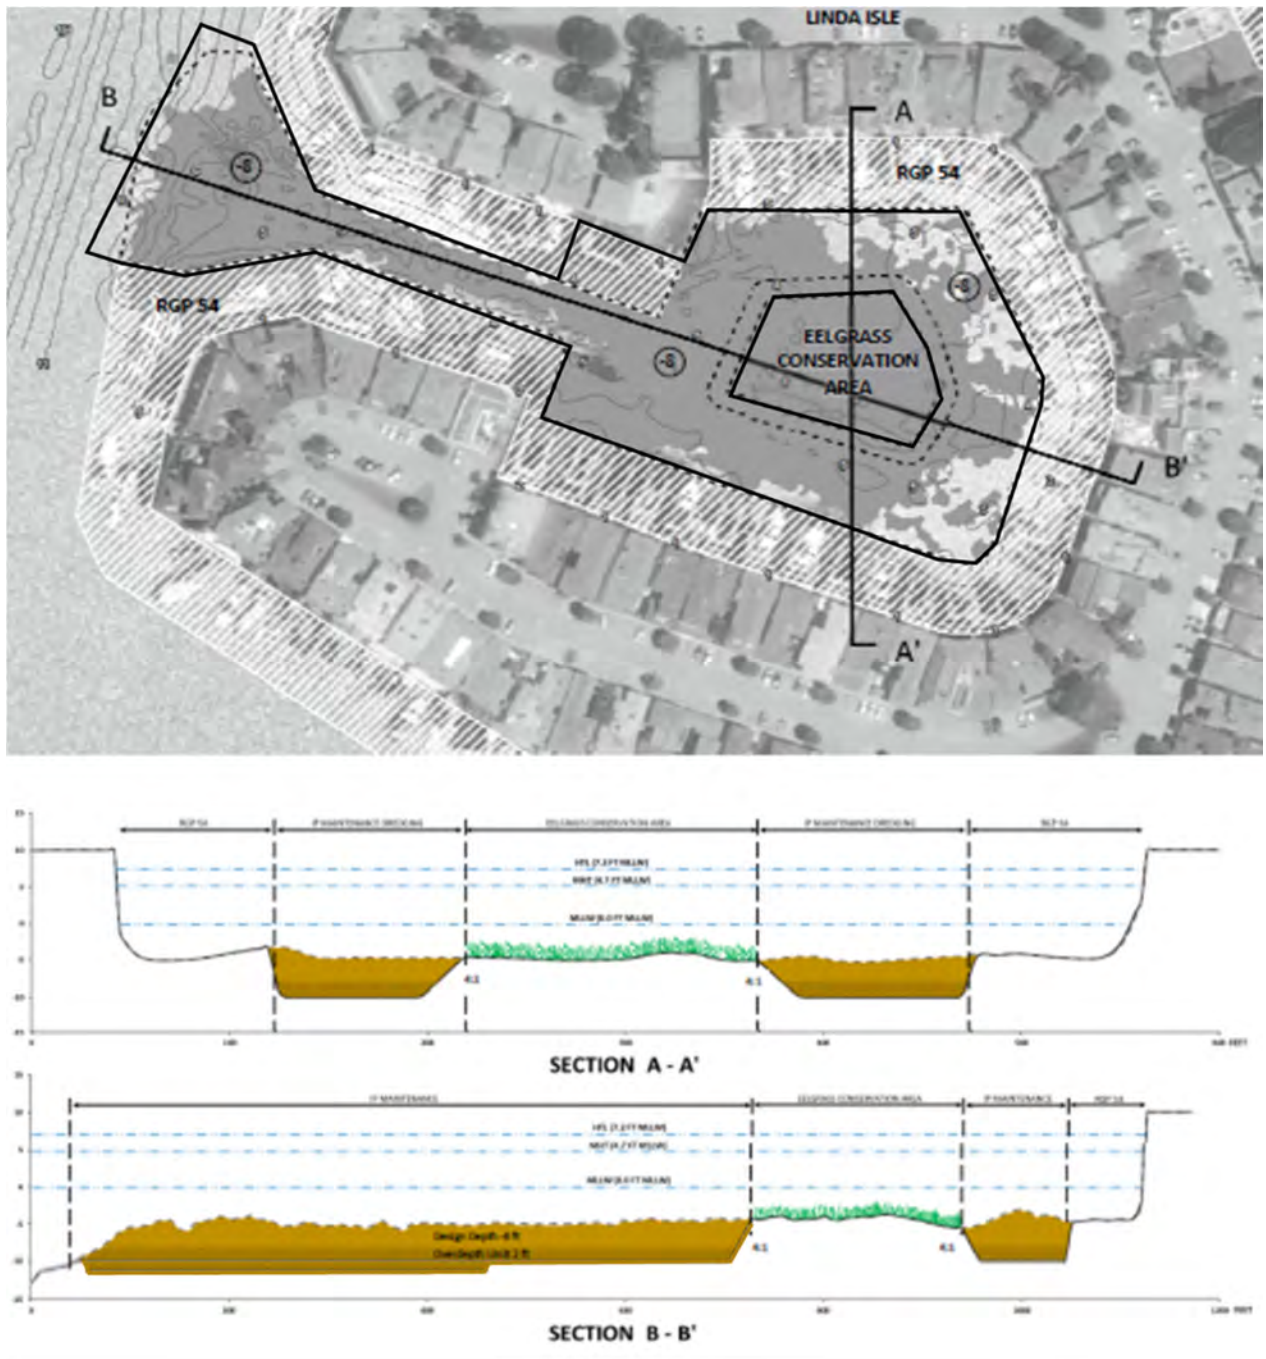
Proposed Linda Isle Lagoon Dredging Plan
